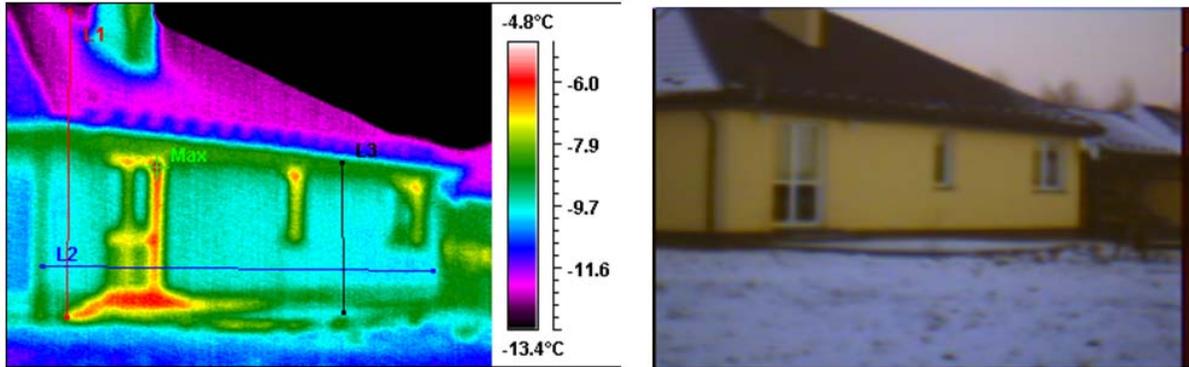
SWB - details of the constructional connections in the “*SUNDAY*®” technology building (fundaments, external walls and floor)
